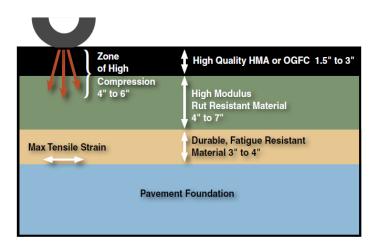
Perpetual Pavement cross-section (Newcomb et al, 2000)
